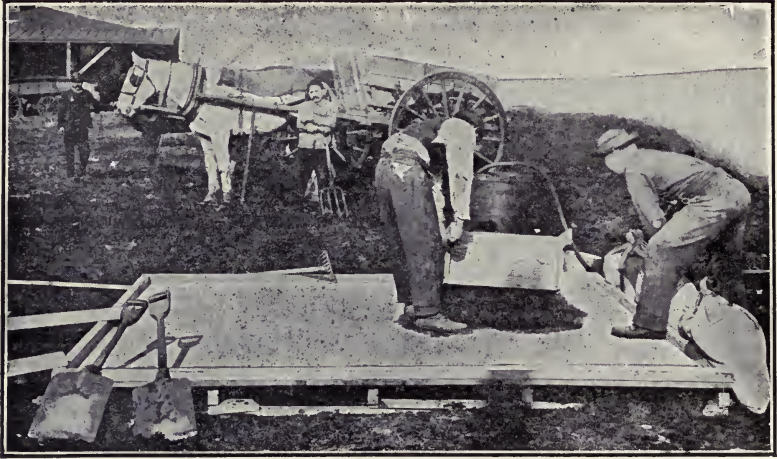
Lifting off the Sand Measuring Box and Getting Cement Ready.
